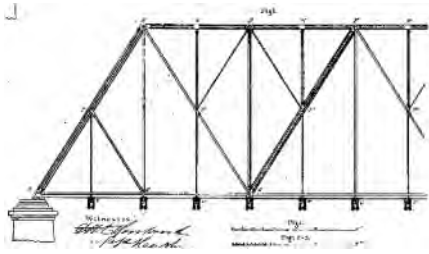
Partial elevation of Albert Fink's Louisville Bridge (adapted from US patent 116,787).
